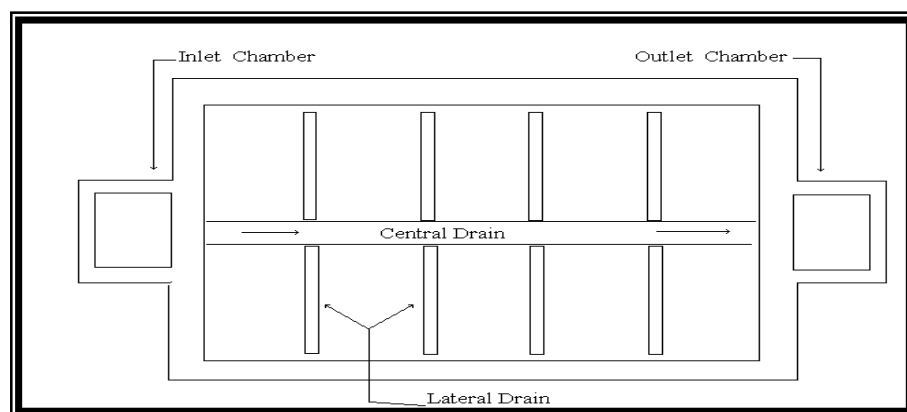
Plan of Under-drainage System in a Rapid Sand Filter
